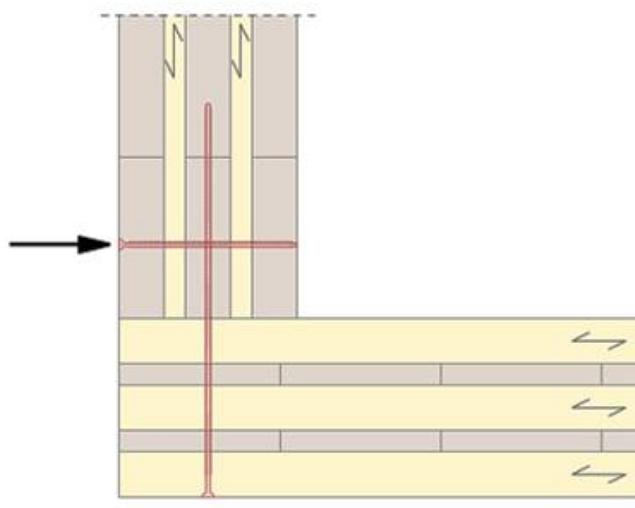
Reinforcement of cross-laminated timber (CLT) members with screws under transverse tensile stress perpendicular to the wide faces
